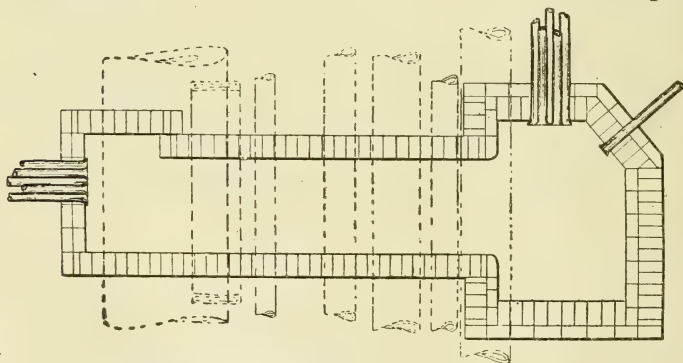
Sectional Plan of Double Manhole (Scale $\frac{1}{4}$)
